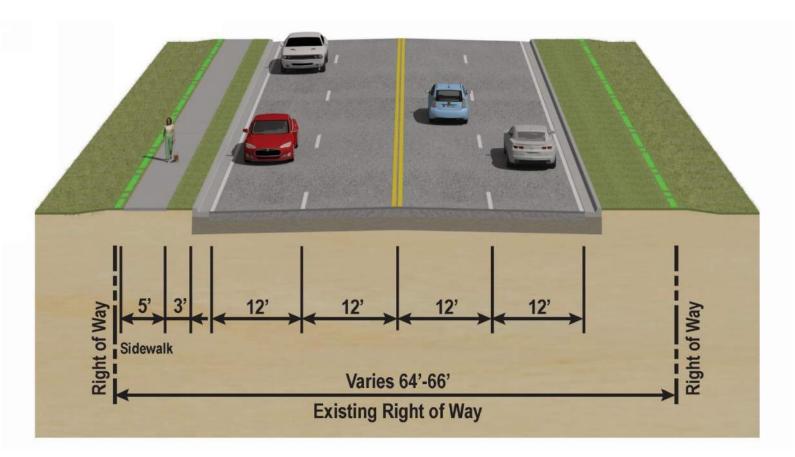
Existing Typical Section – La Vista Drive to SR 17
